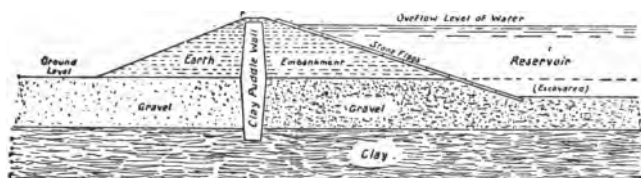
Section of earth dam, with clay puddle central wall, used for shallow reservoirs.
